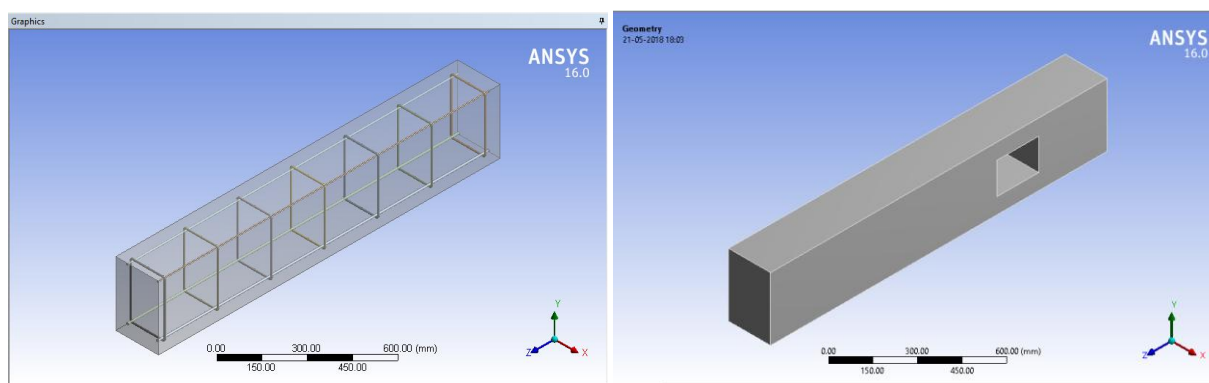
(a) Model of concrete beam with reinforcement (b) Model of Rectangular beam with opening
